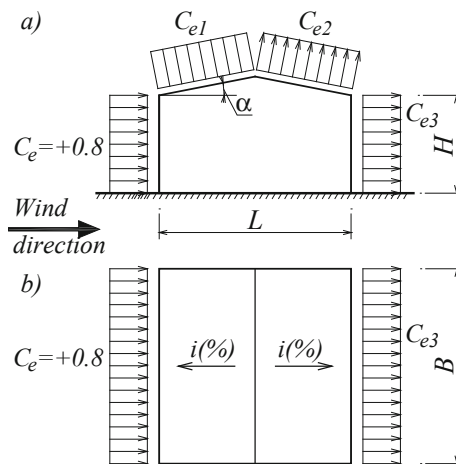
Wind load on a low-rise building with pitch roof; $C_e, C_{e1} \div C_{e3}$ - aerodynamic factor
